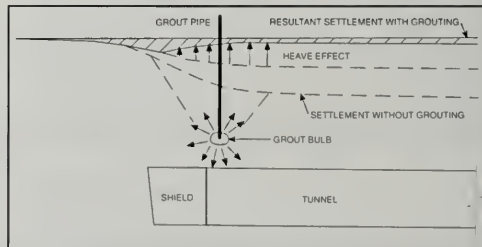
Compaction grouting concept. Grout is injected in bulbs above the tunnel to compensate for loss of ground.
